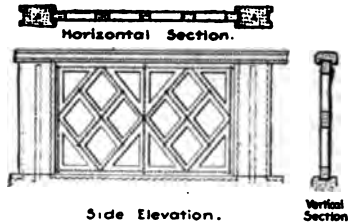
Details of Hand Railings, Deer Park Gorge Bridge.
